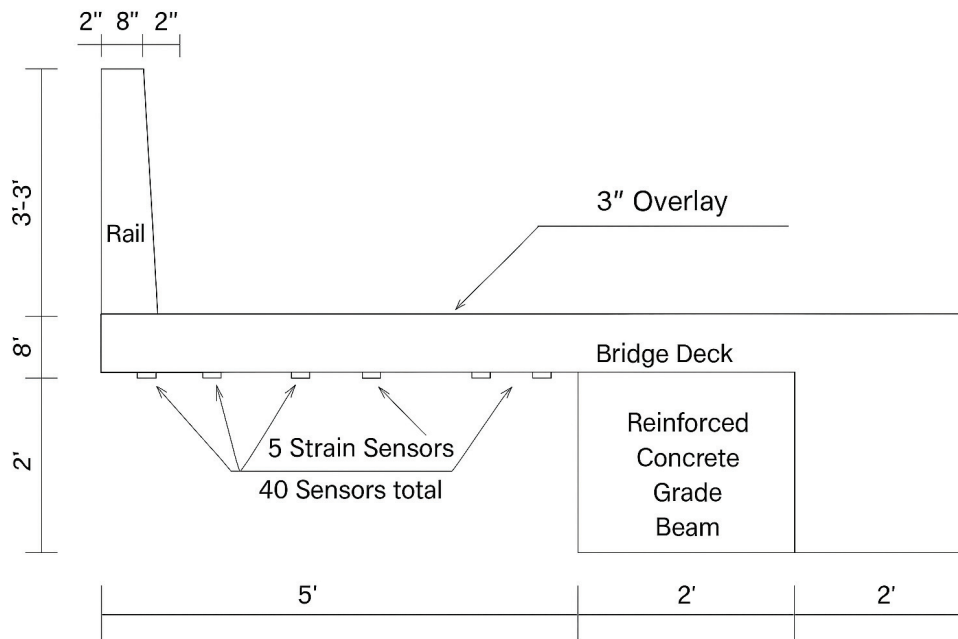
Illustration of half of the bridge showing deployed sensors, including measurements, rail, and reinforced concrete beam. The other half follows the same sensor pattern.
